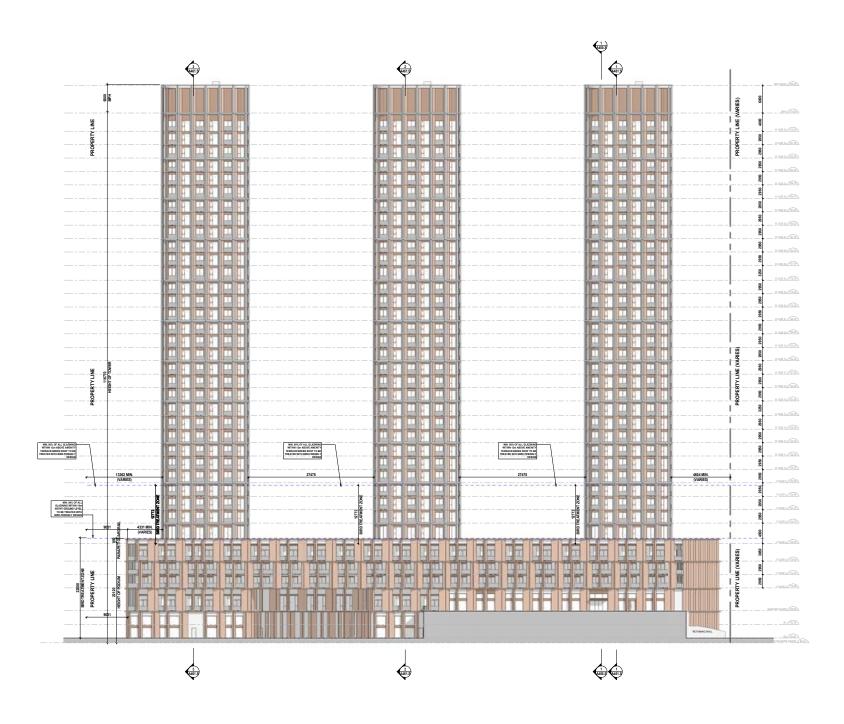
BUILDINGS 3/4/5 NORTH ELEVATION (BDP. QUADRANGLE ARCHITECTS LTD.)
